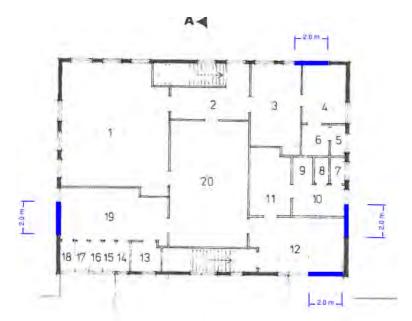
Maintenance Building First Floor Plan – Proposed 67% Strengthening
